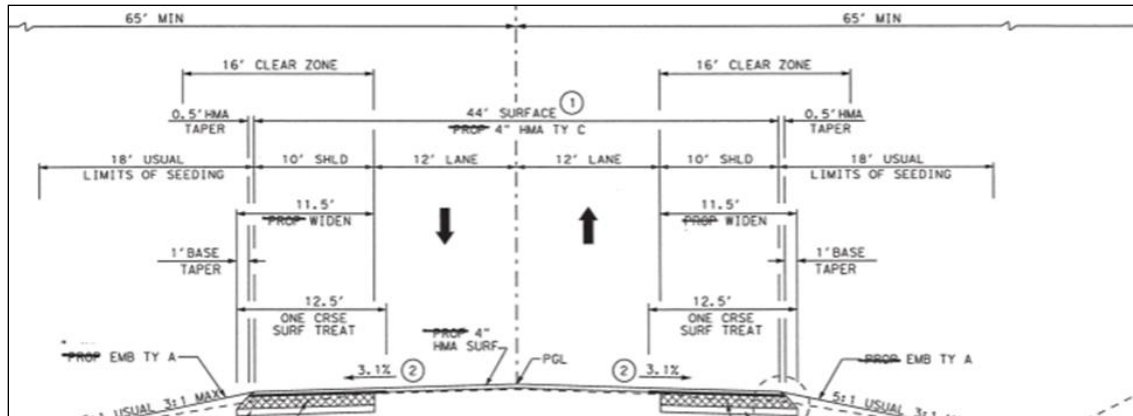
Post-Construction Typical Section Example 1, Project 1.
